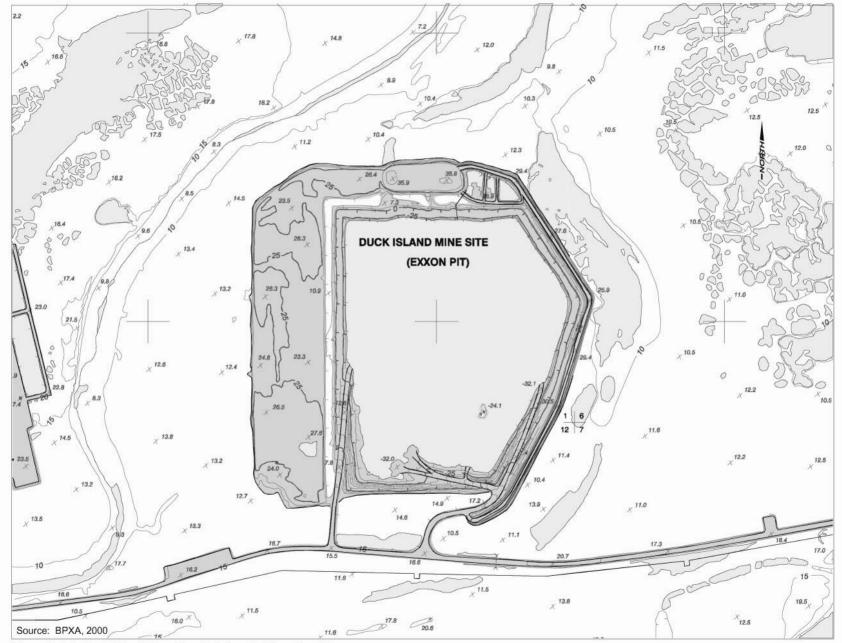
Duck Island Mine Site - Existing Facility - Plan View
